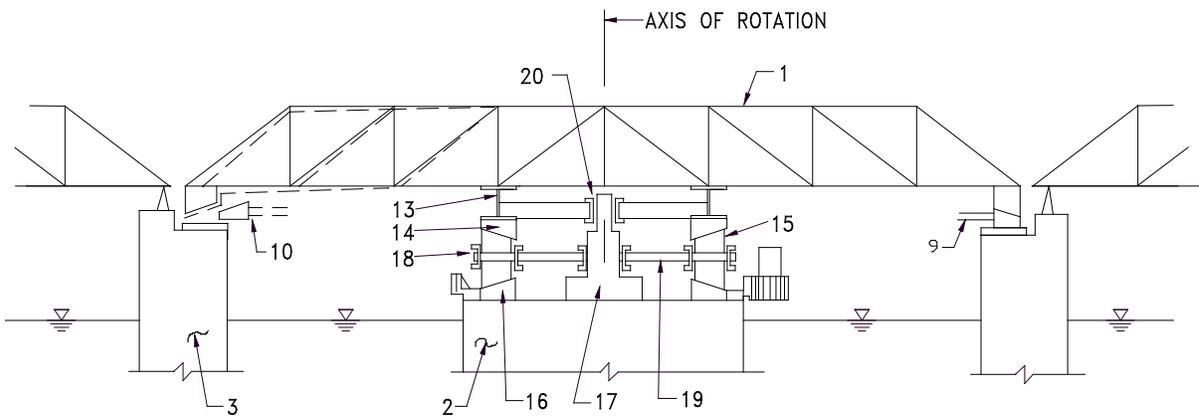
(a) is a diagram of an equal-arm center-bearing swing bridge. The spanning member is shown as a truss; it could as well be a girder. The draw weight is balanced on the pivot bearing, which is mechanical in the figure, but could be hydraulic. To prevent the draw from tipping under unbalanced loads, such as wind, balance wheels are provided that roll on a large-diameter circular track concentric with the pivot bearing. When the draw is balanced these wheels normally clear the track by about 0.2 inch (5 mm). The design intent is that the center bearing support all the dead load when the draw is open. Figure 3.4.2-1 (a) shows a center bearing swing bridge with a plain mechanical pivot bearing, comprised of a lenticular bronze disc between hardened steel concave discs. Sometimes two-part bearings are used. Plain bearings are most common. However, spherical antifriction rolling element bearings are being specified more frequently for new bridges. Hydraulic bearings that support the entire dead load have been used for some center bearing swing bridges.
